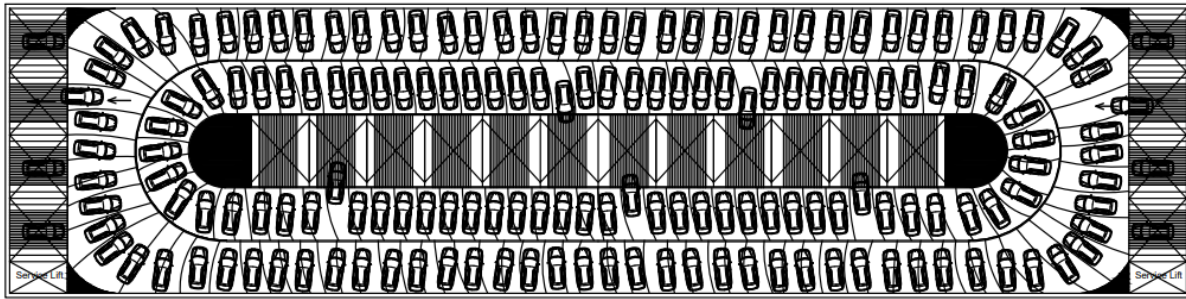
Story Layout of Proposed Smart Conveyor Track Multi- Story Car Parking
